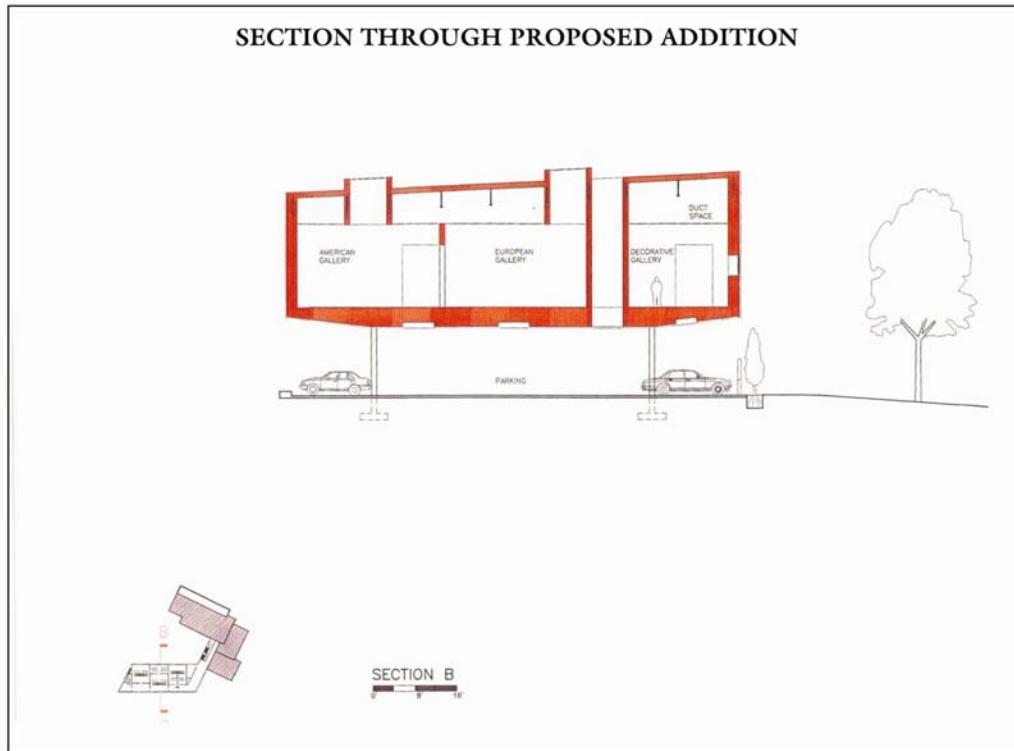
Section Through Proposed Addition, showing sloped roof.
